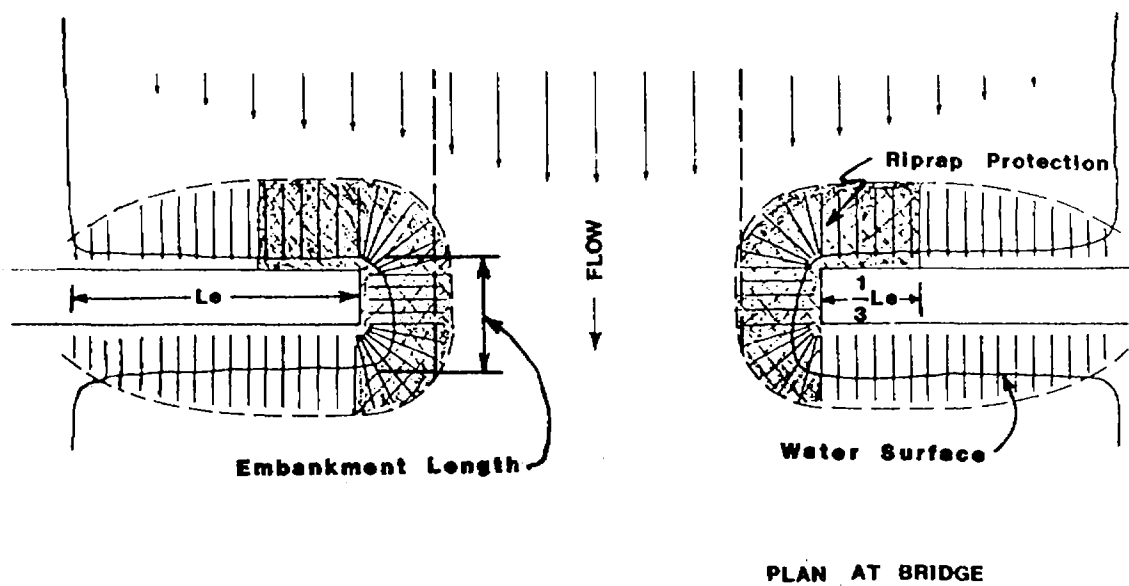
Location of Riprap Protection on a Bridge Approach Embankment
